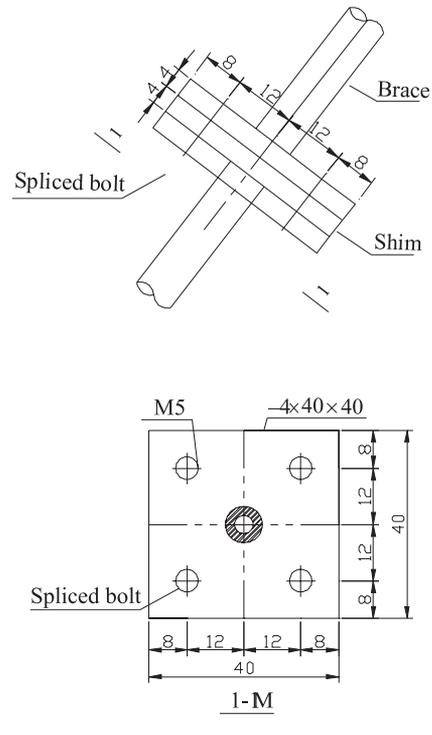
Internal structure of damage simulation position: a – spliced connection; b – cross-section
